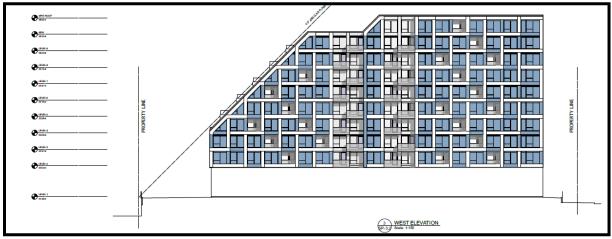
2023 Proposed Development at 6179 Lundy's Lane West Elevation (Provided by MB1 Urban Planning 2023)
